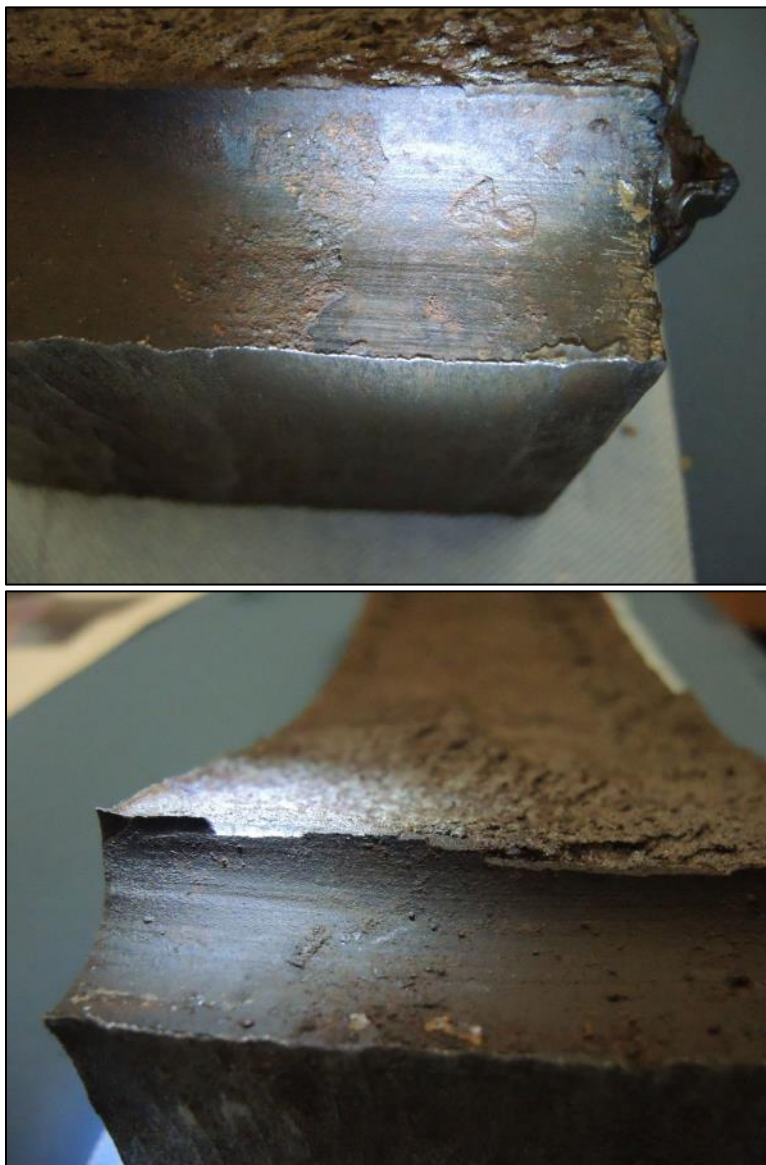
Weld access hole surfaces in samples D.4-SW (top) and E.6-SW (bottom).
